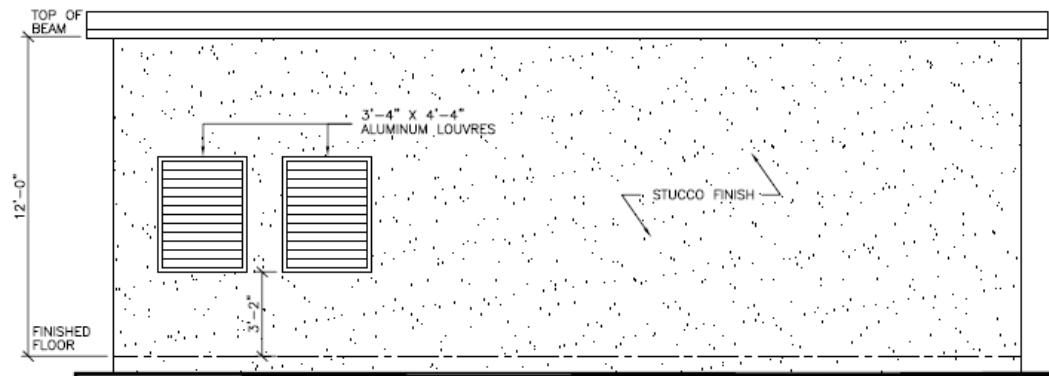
Typical Equipment Building Layout – Side End Elevations
